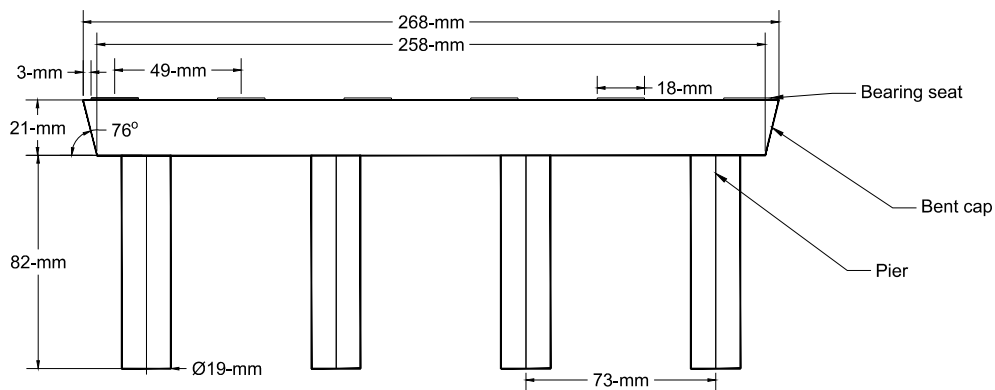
Schematic of bridge substructure (i.e., piers and bent caps)
